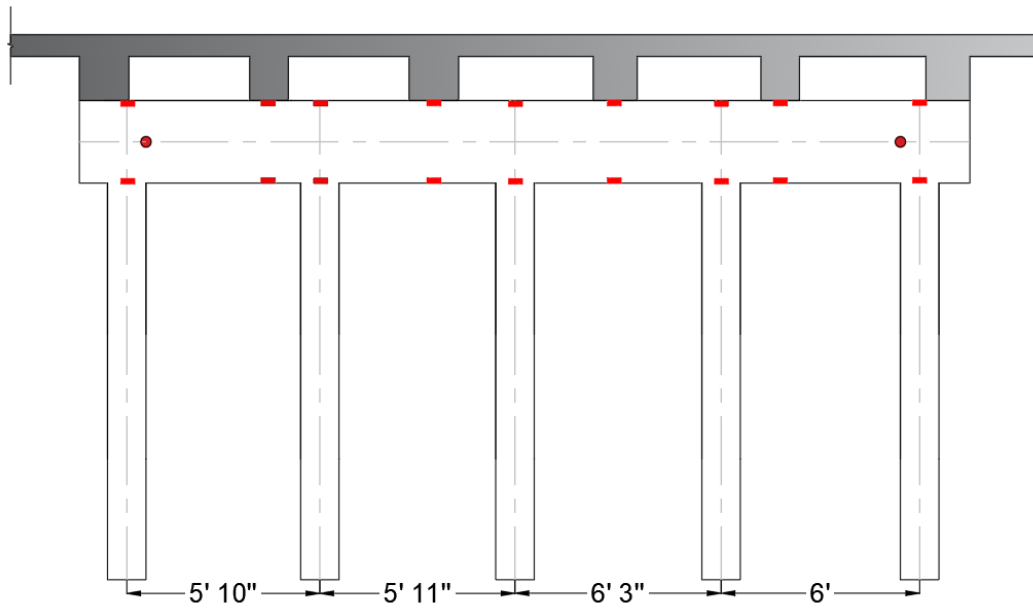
Instrumentation plan for bent caps 37 and 36
